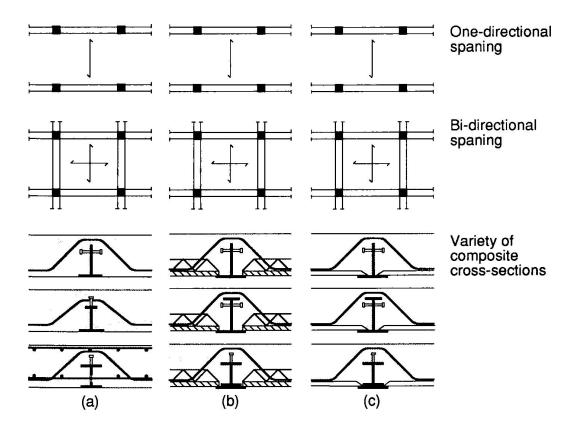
S+V cross sections based either on a timber shutter (a), prefabricated filigree concrete decks (b) or profiled steel sheets (c)
